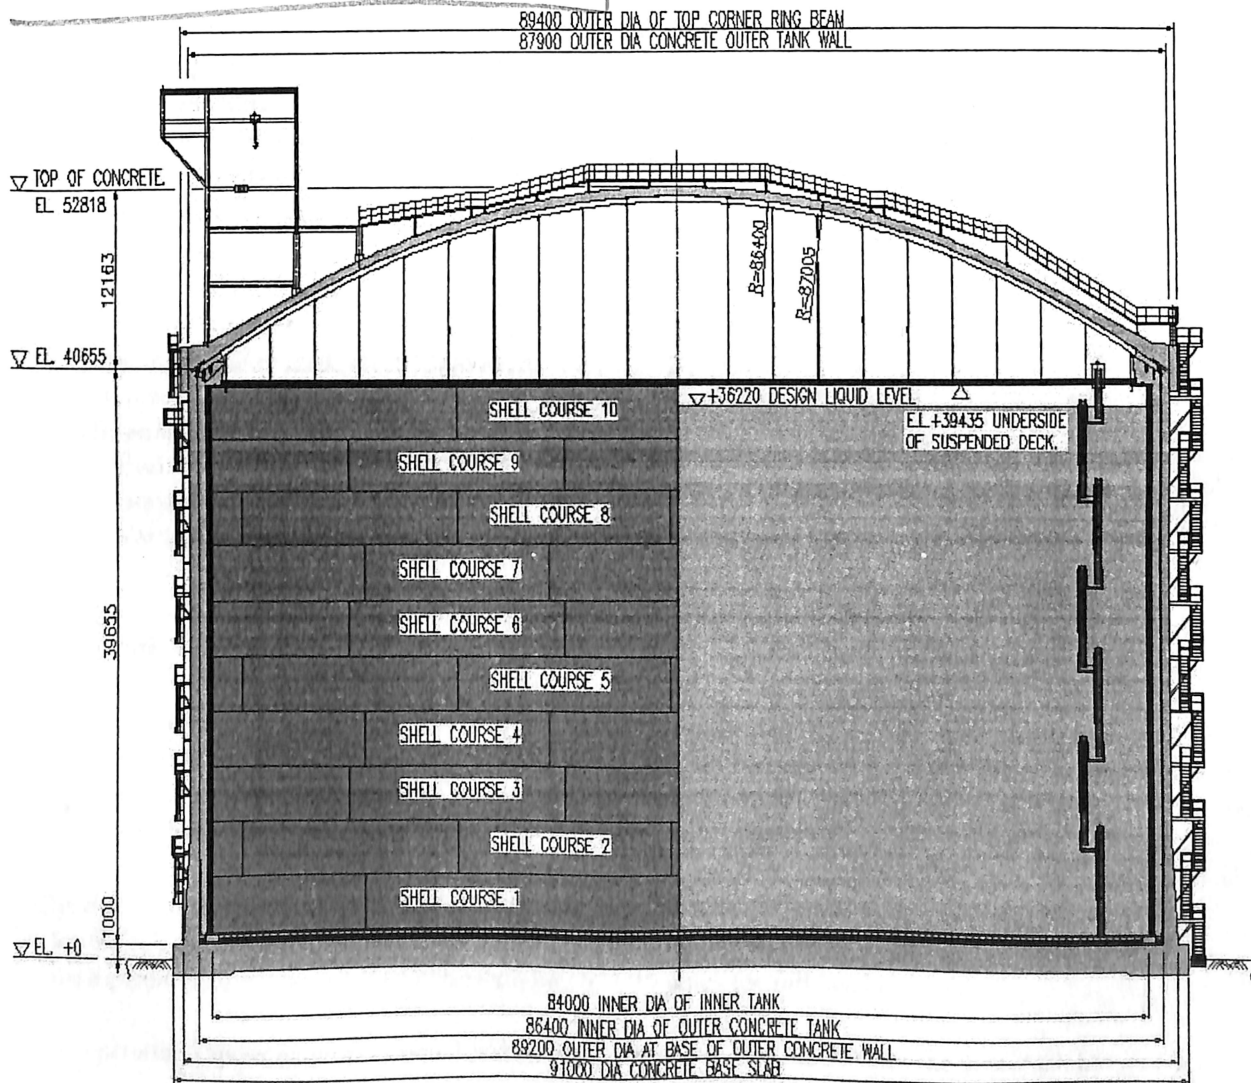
Sectional view of the 200,000m³ full containment LNG storage tank
